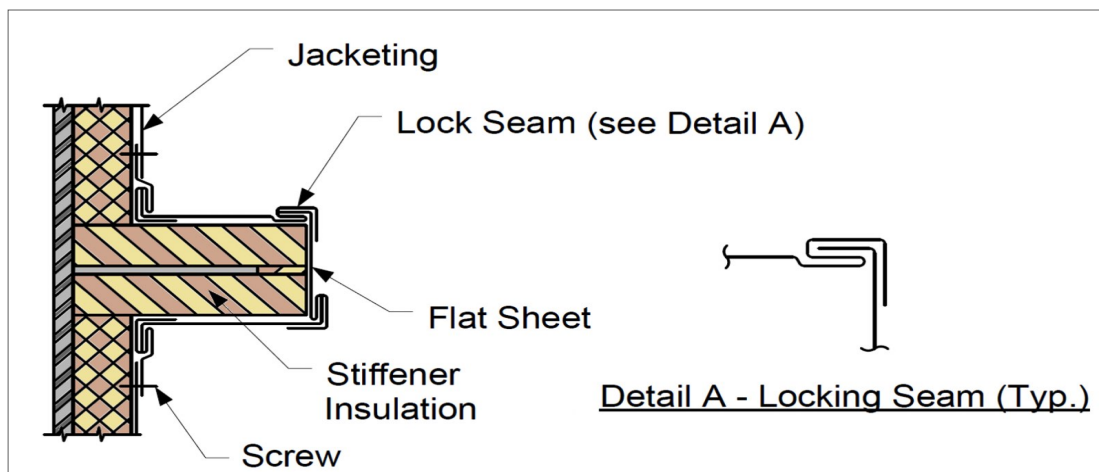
Recommended Structural Stiffening Ring Insulation and Water-Tight Jacketing/Sheathing Detail.
